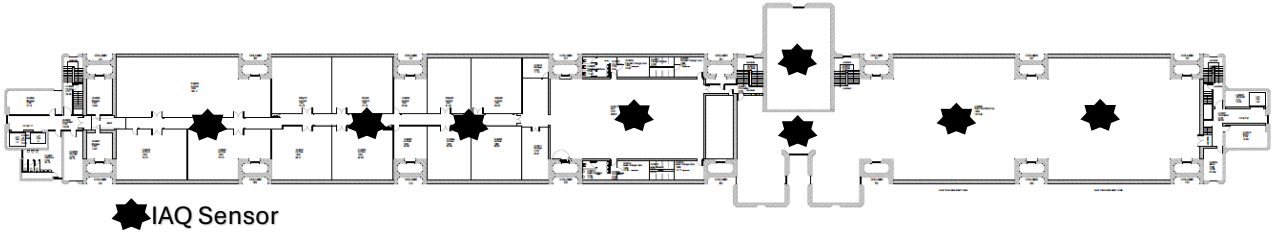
Tower Building proposed sensor positioning 23rd floor/Roof (8).
